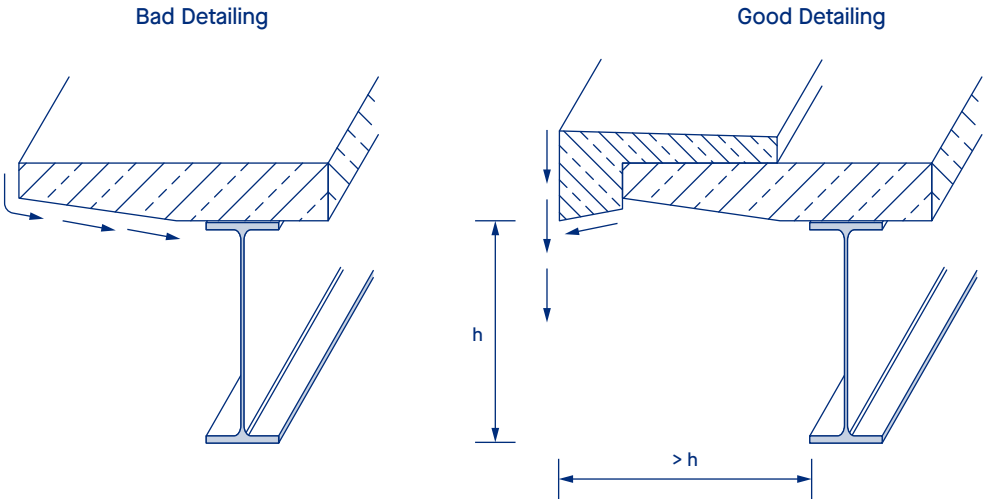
Drip details at the caps or edges of concrete decks and overhang
